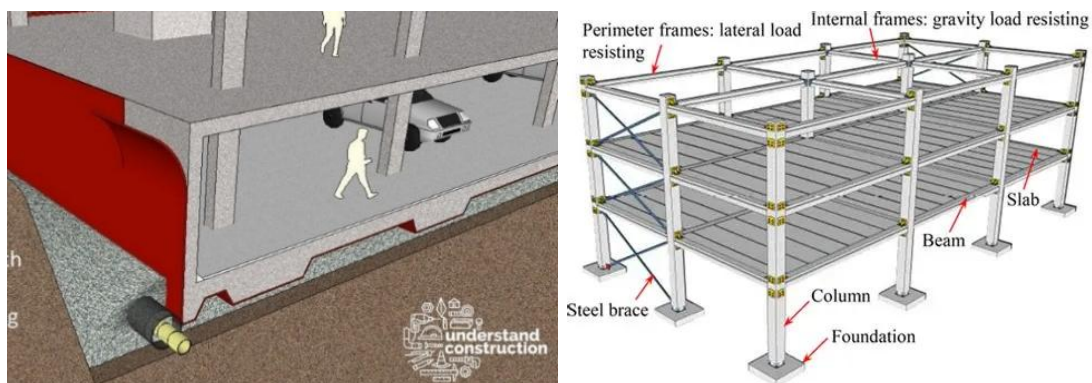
Raft foundation and concrete frame system (Understand Building Construction, (n.d.); American Society of Civil Engineers, (n.d.))
